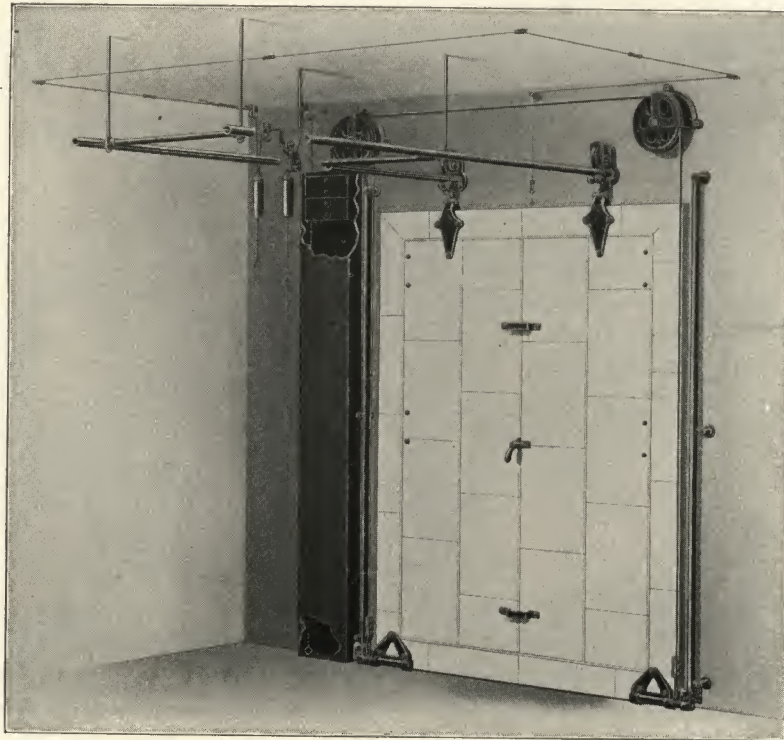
No. 649 Fire Door Fixtures Applied to Tin Clad Fire Door.
